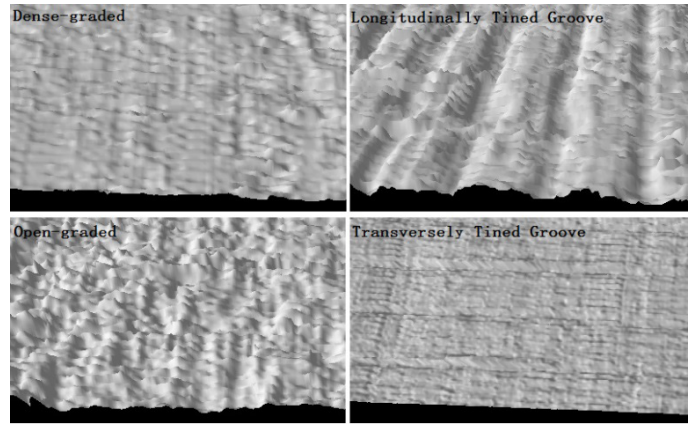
Examples of 1mm 3D pavement surface image with texture details.
